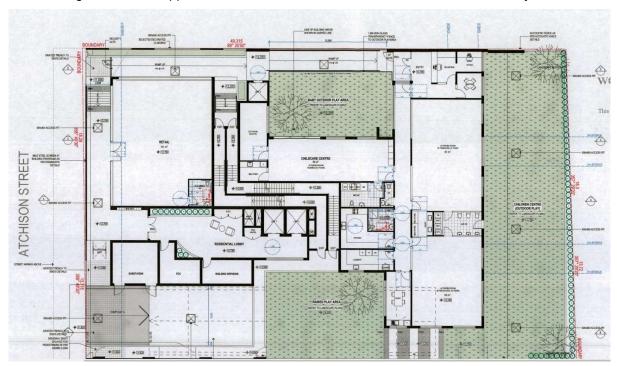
Ground floor of 31 Atchison Street, to the south-west of the site
